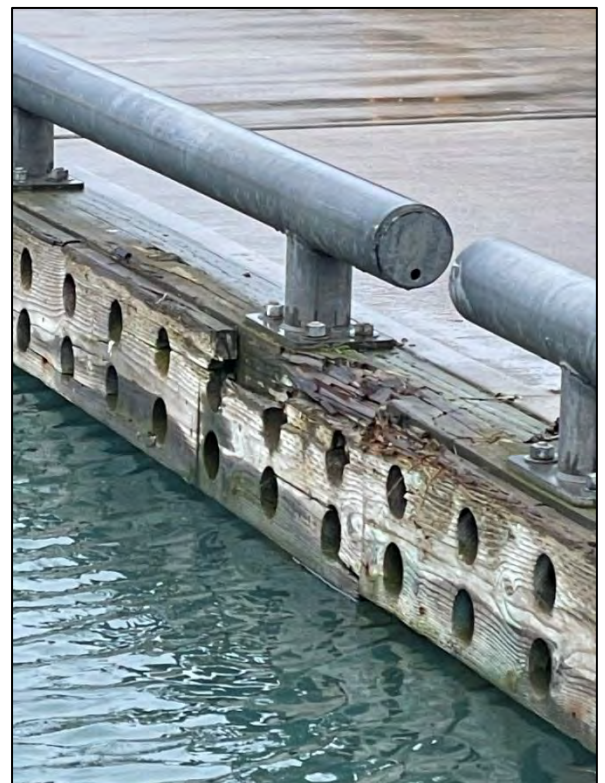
Deteriorated timber rubboard and waler. Steel bullrail mounted in waler.
